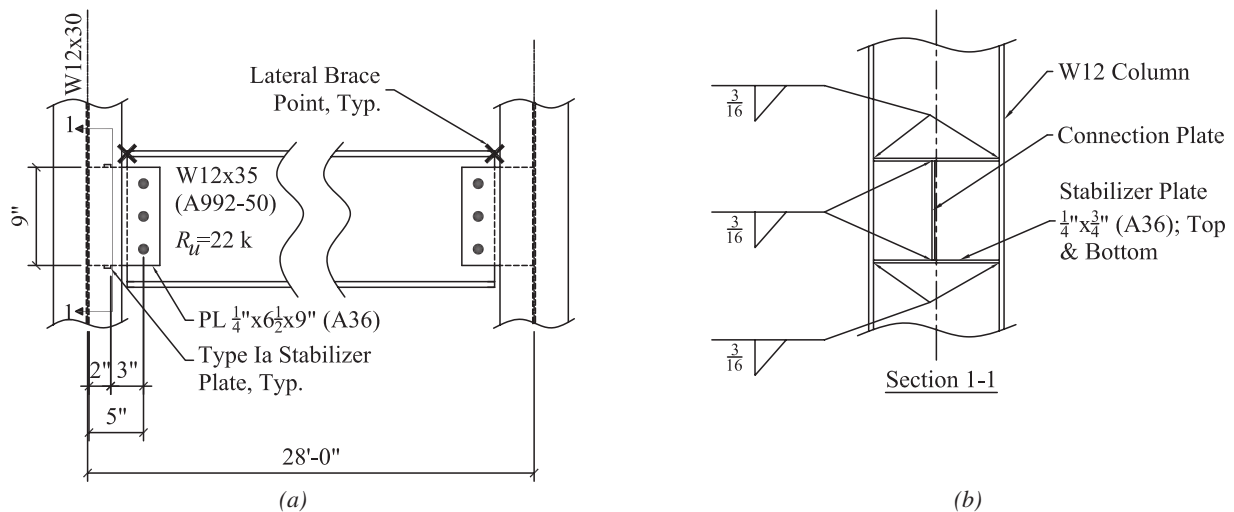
Single-plate shear connection referenced in Example Problem 1: (a) elevation; (b) final stabilizer plate details.
